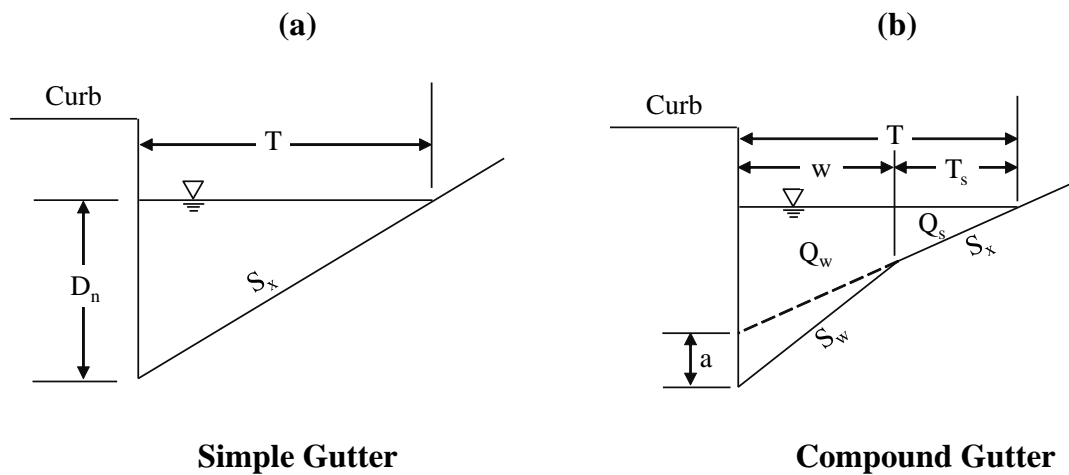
Roadway sections: (a) uniform section, (b) composite section.
